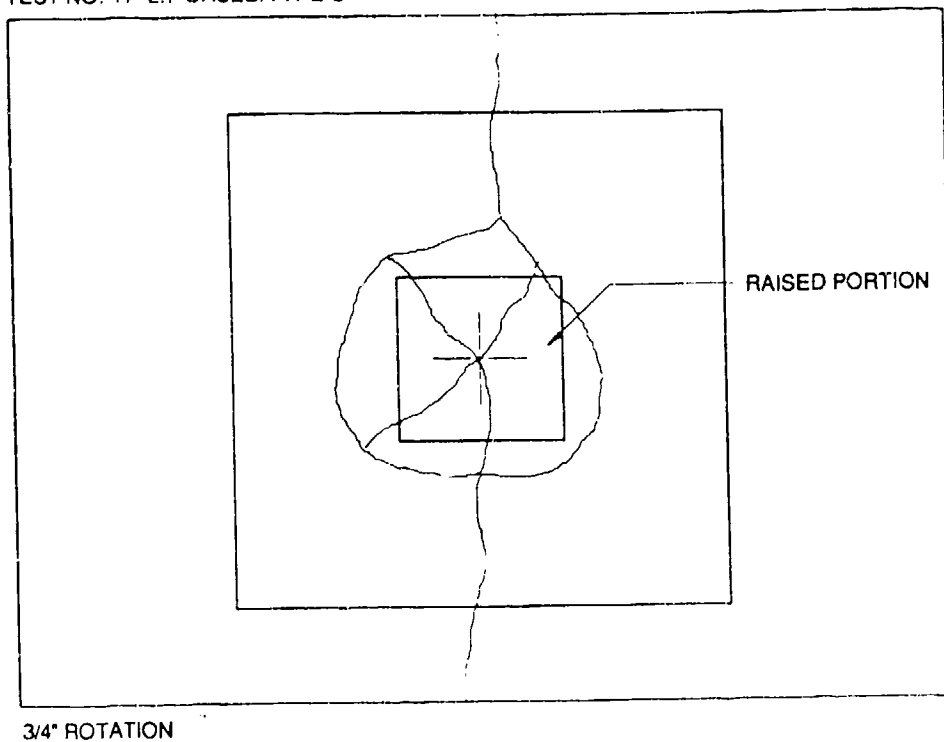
A Schematic of Test 17 Wall Damage (Type C, 2.7-Pound Cased Charge).
